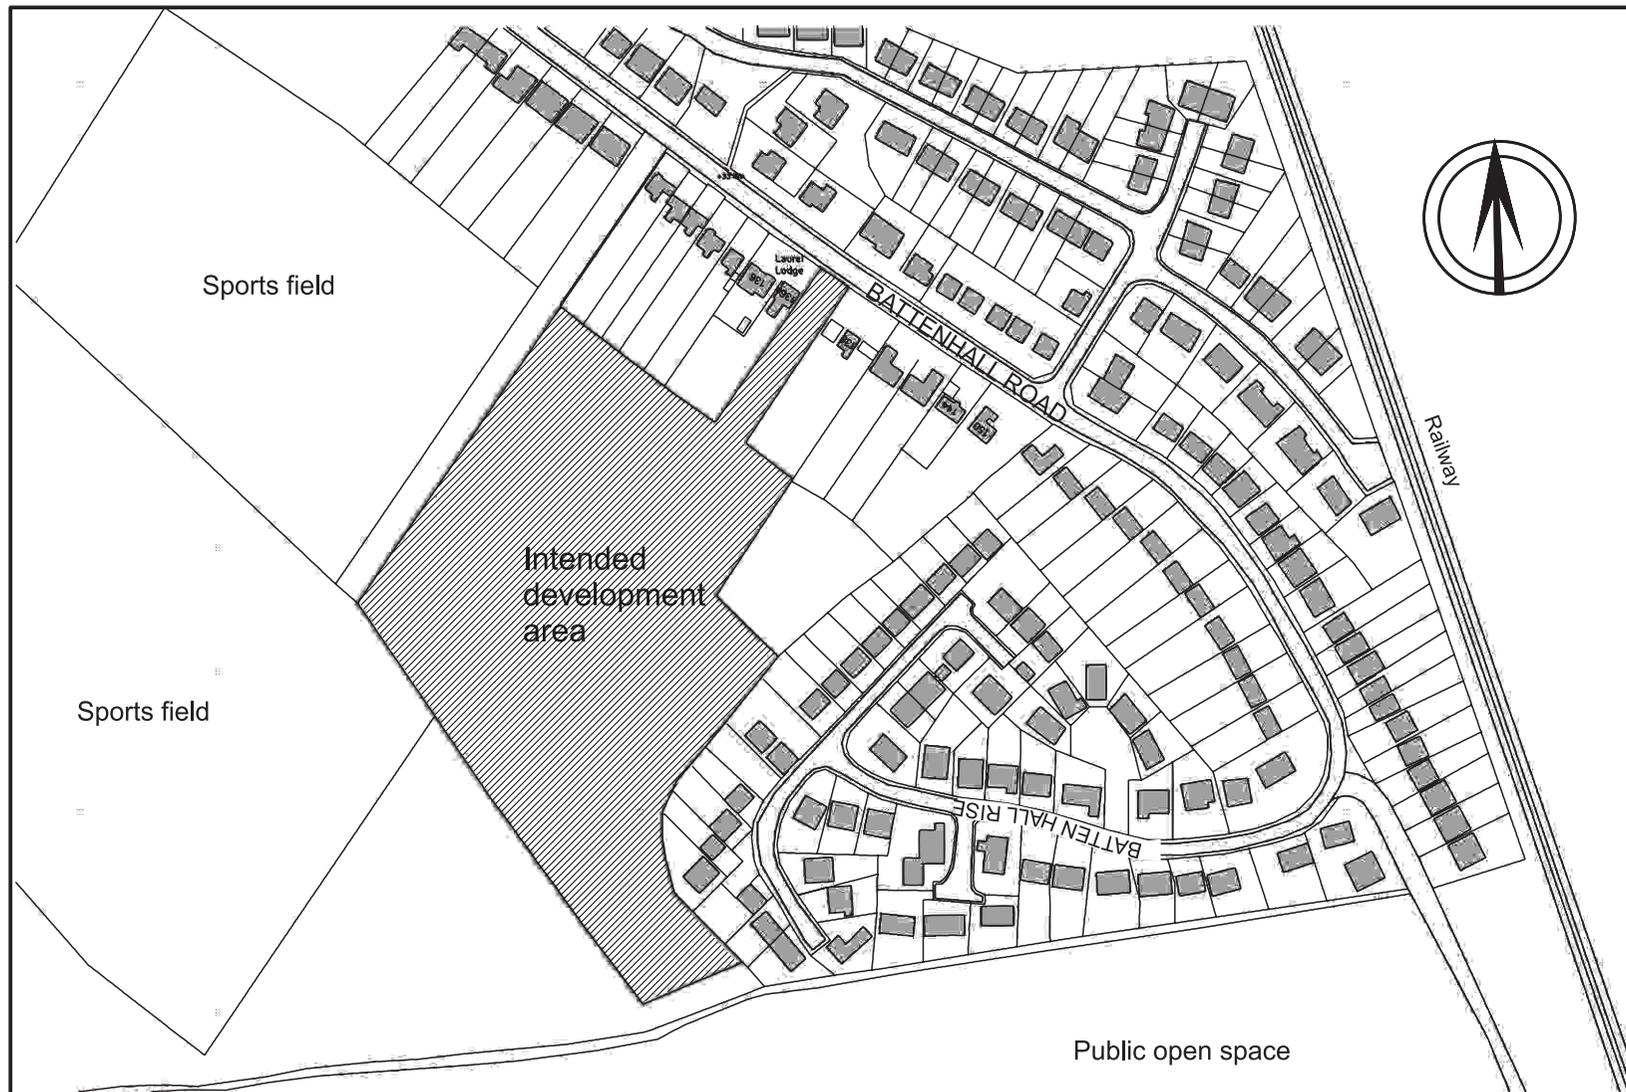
Site location plan (based on drawing by Glazzards Architects)
